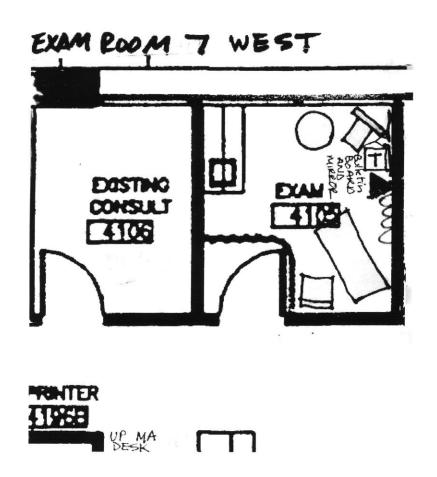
Drawing of exam room #7 west. Focus of drawing is furniture layout, perimeter location and adjacency to up-medical assistant workspace.
